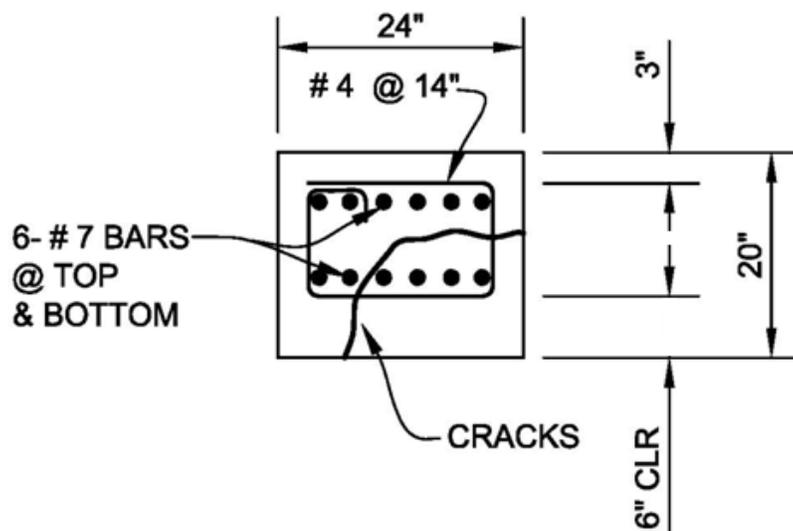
Pile cap section (with cracks). Channel lining on the right not shown. Concrete on the approach side as well as at the top were not investigated for the cracks.
